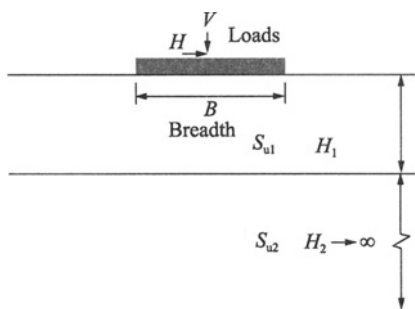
The strip footing on two-layered soil foundation under vertical and horizontal loading
